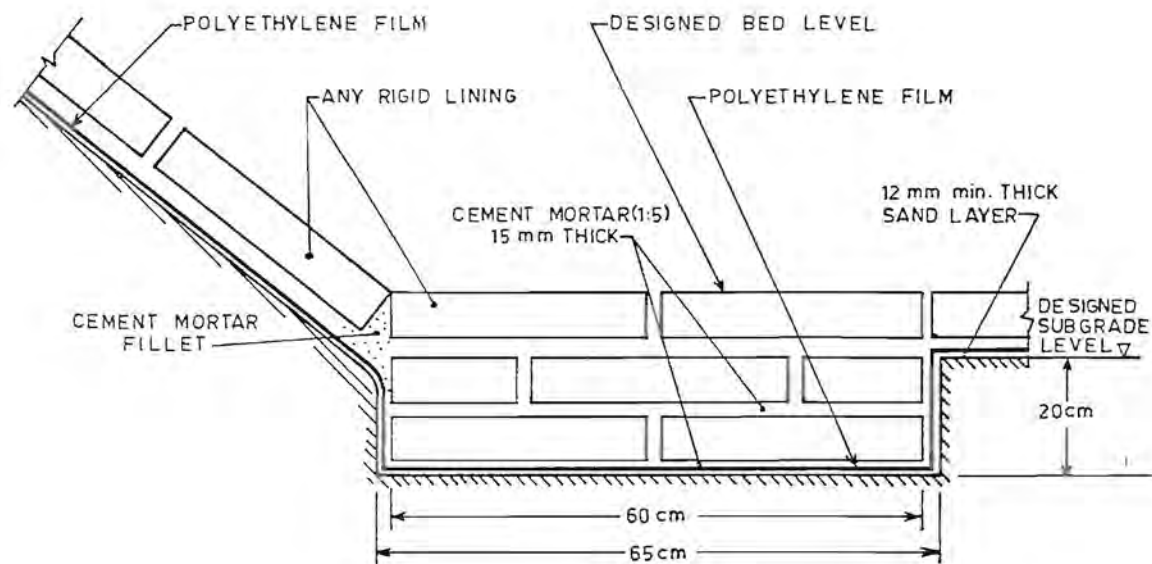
TOE WALL CONSTRUCTION DETAILS
